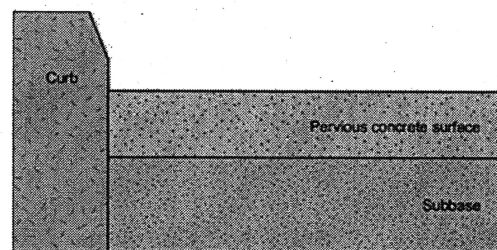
Typical cross section of porous concrete pavement. On level subgrades, stormwater storage is provided in the porous concrete surface layer. [10]
